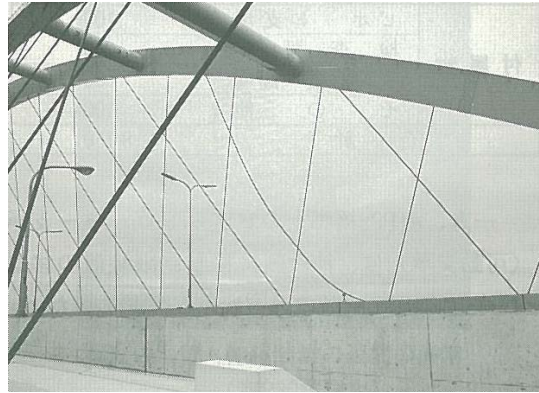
Loosening of a cable in a Nielsen arch bridge at the anchor socket
